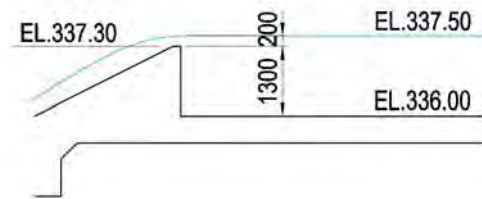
Water Level at Downstream (Oeste Dam)
